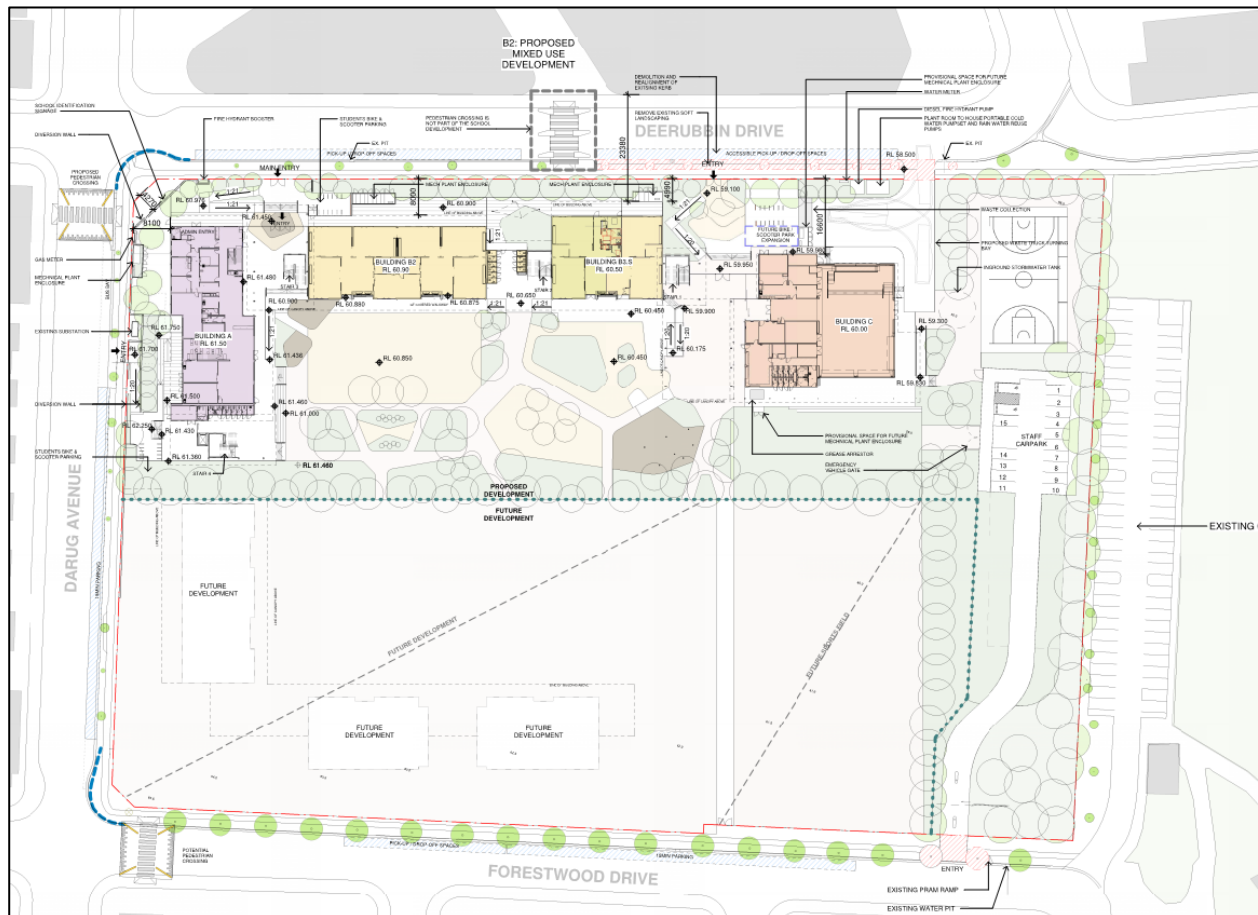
Source is5-0 Site Plan 20415-NBRS-DR-A-SSDA-0110 Rev 8
